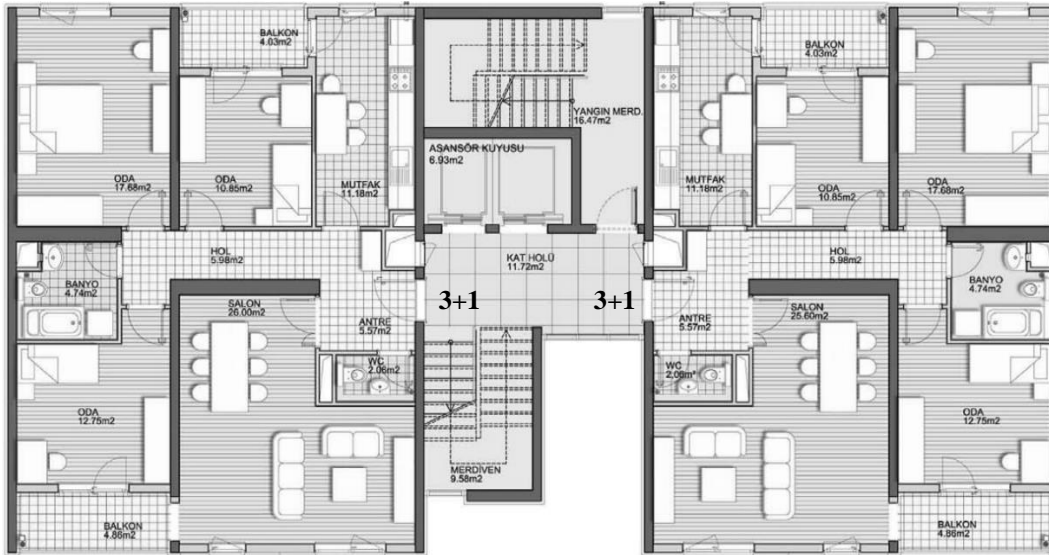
B2 Block Floor Plan 3+1 Apartments
